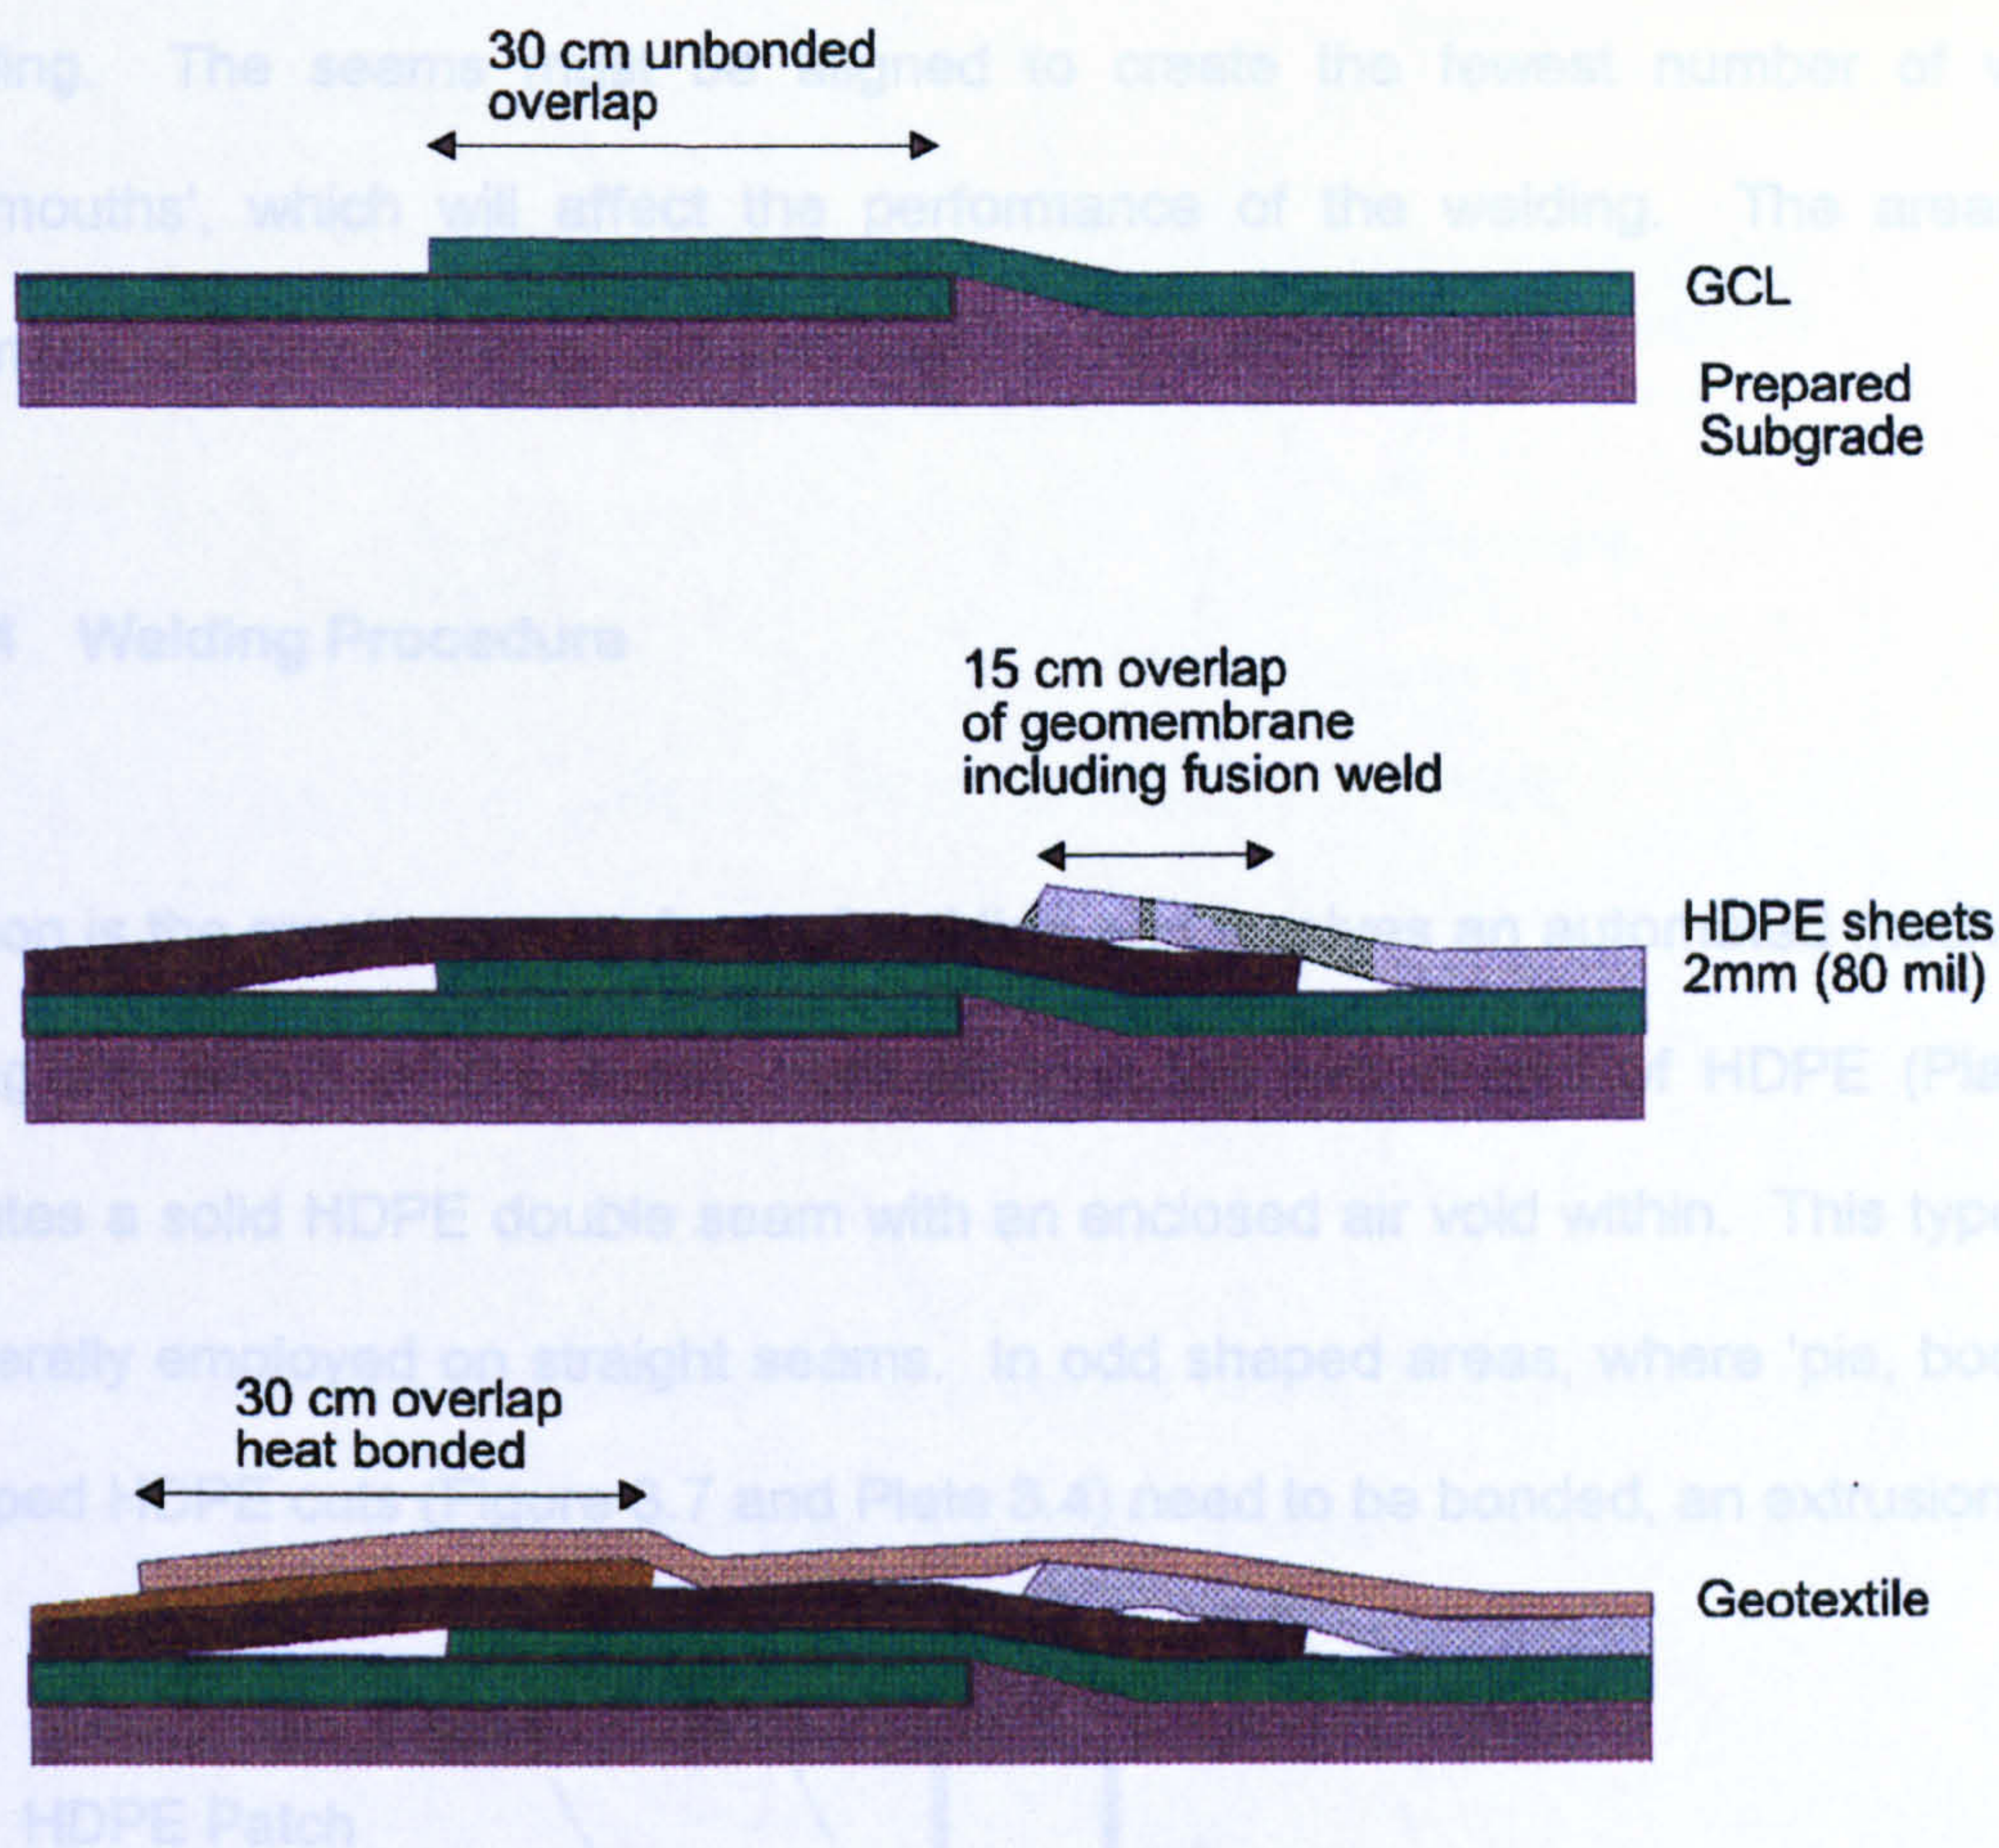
Composite Liner Overlap Detail. Adapted from details in Gundle, (1995).
